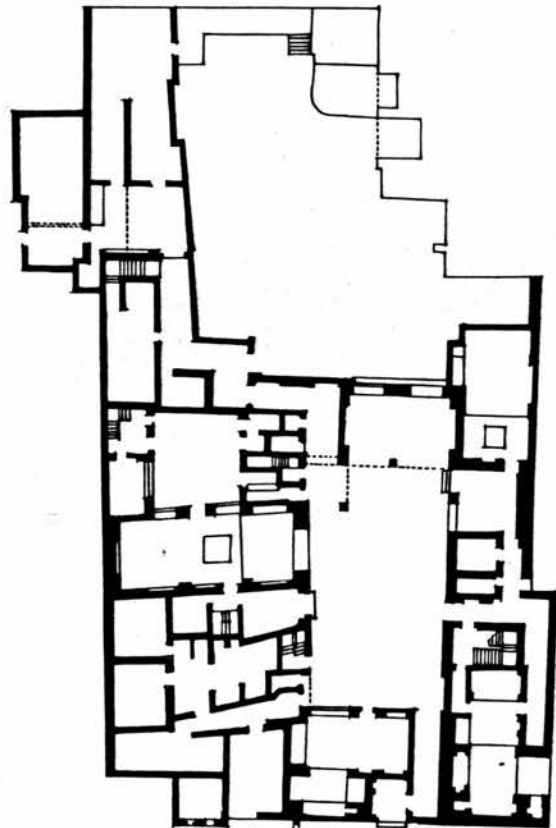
Plan of the ground floor of El-Sehimi house (17th century)
